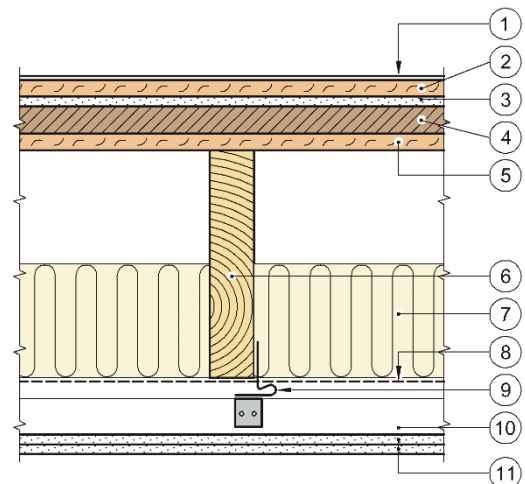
shows the principle design of floating floors inside the same housing unit. The length is adjusted to suit the house width. The elements are normally delivered on-the building site with joists, floor sheathing (subfloor) and to some extent insulation, while further completion is carried out on the building site. For floors between separate apartments, see fig 9, the elements are supplemented with a floating floor on top and a ceiling construction as recommended in SINTEF Building Research Design Guide 522.511.
